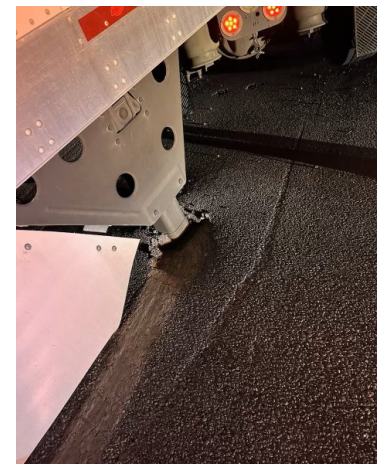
Damage to pavement from a stuck truck in Newberry Township. Photo: PennDOT LTAP.
